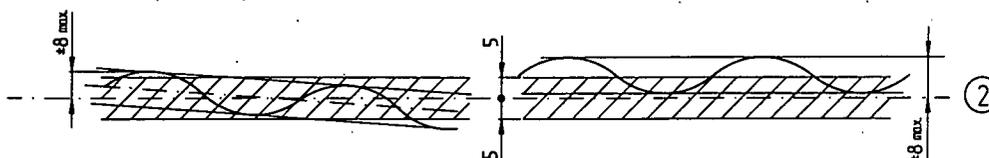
Tolerances for the upper guide rail (plan view)
